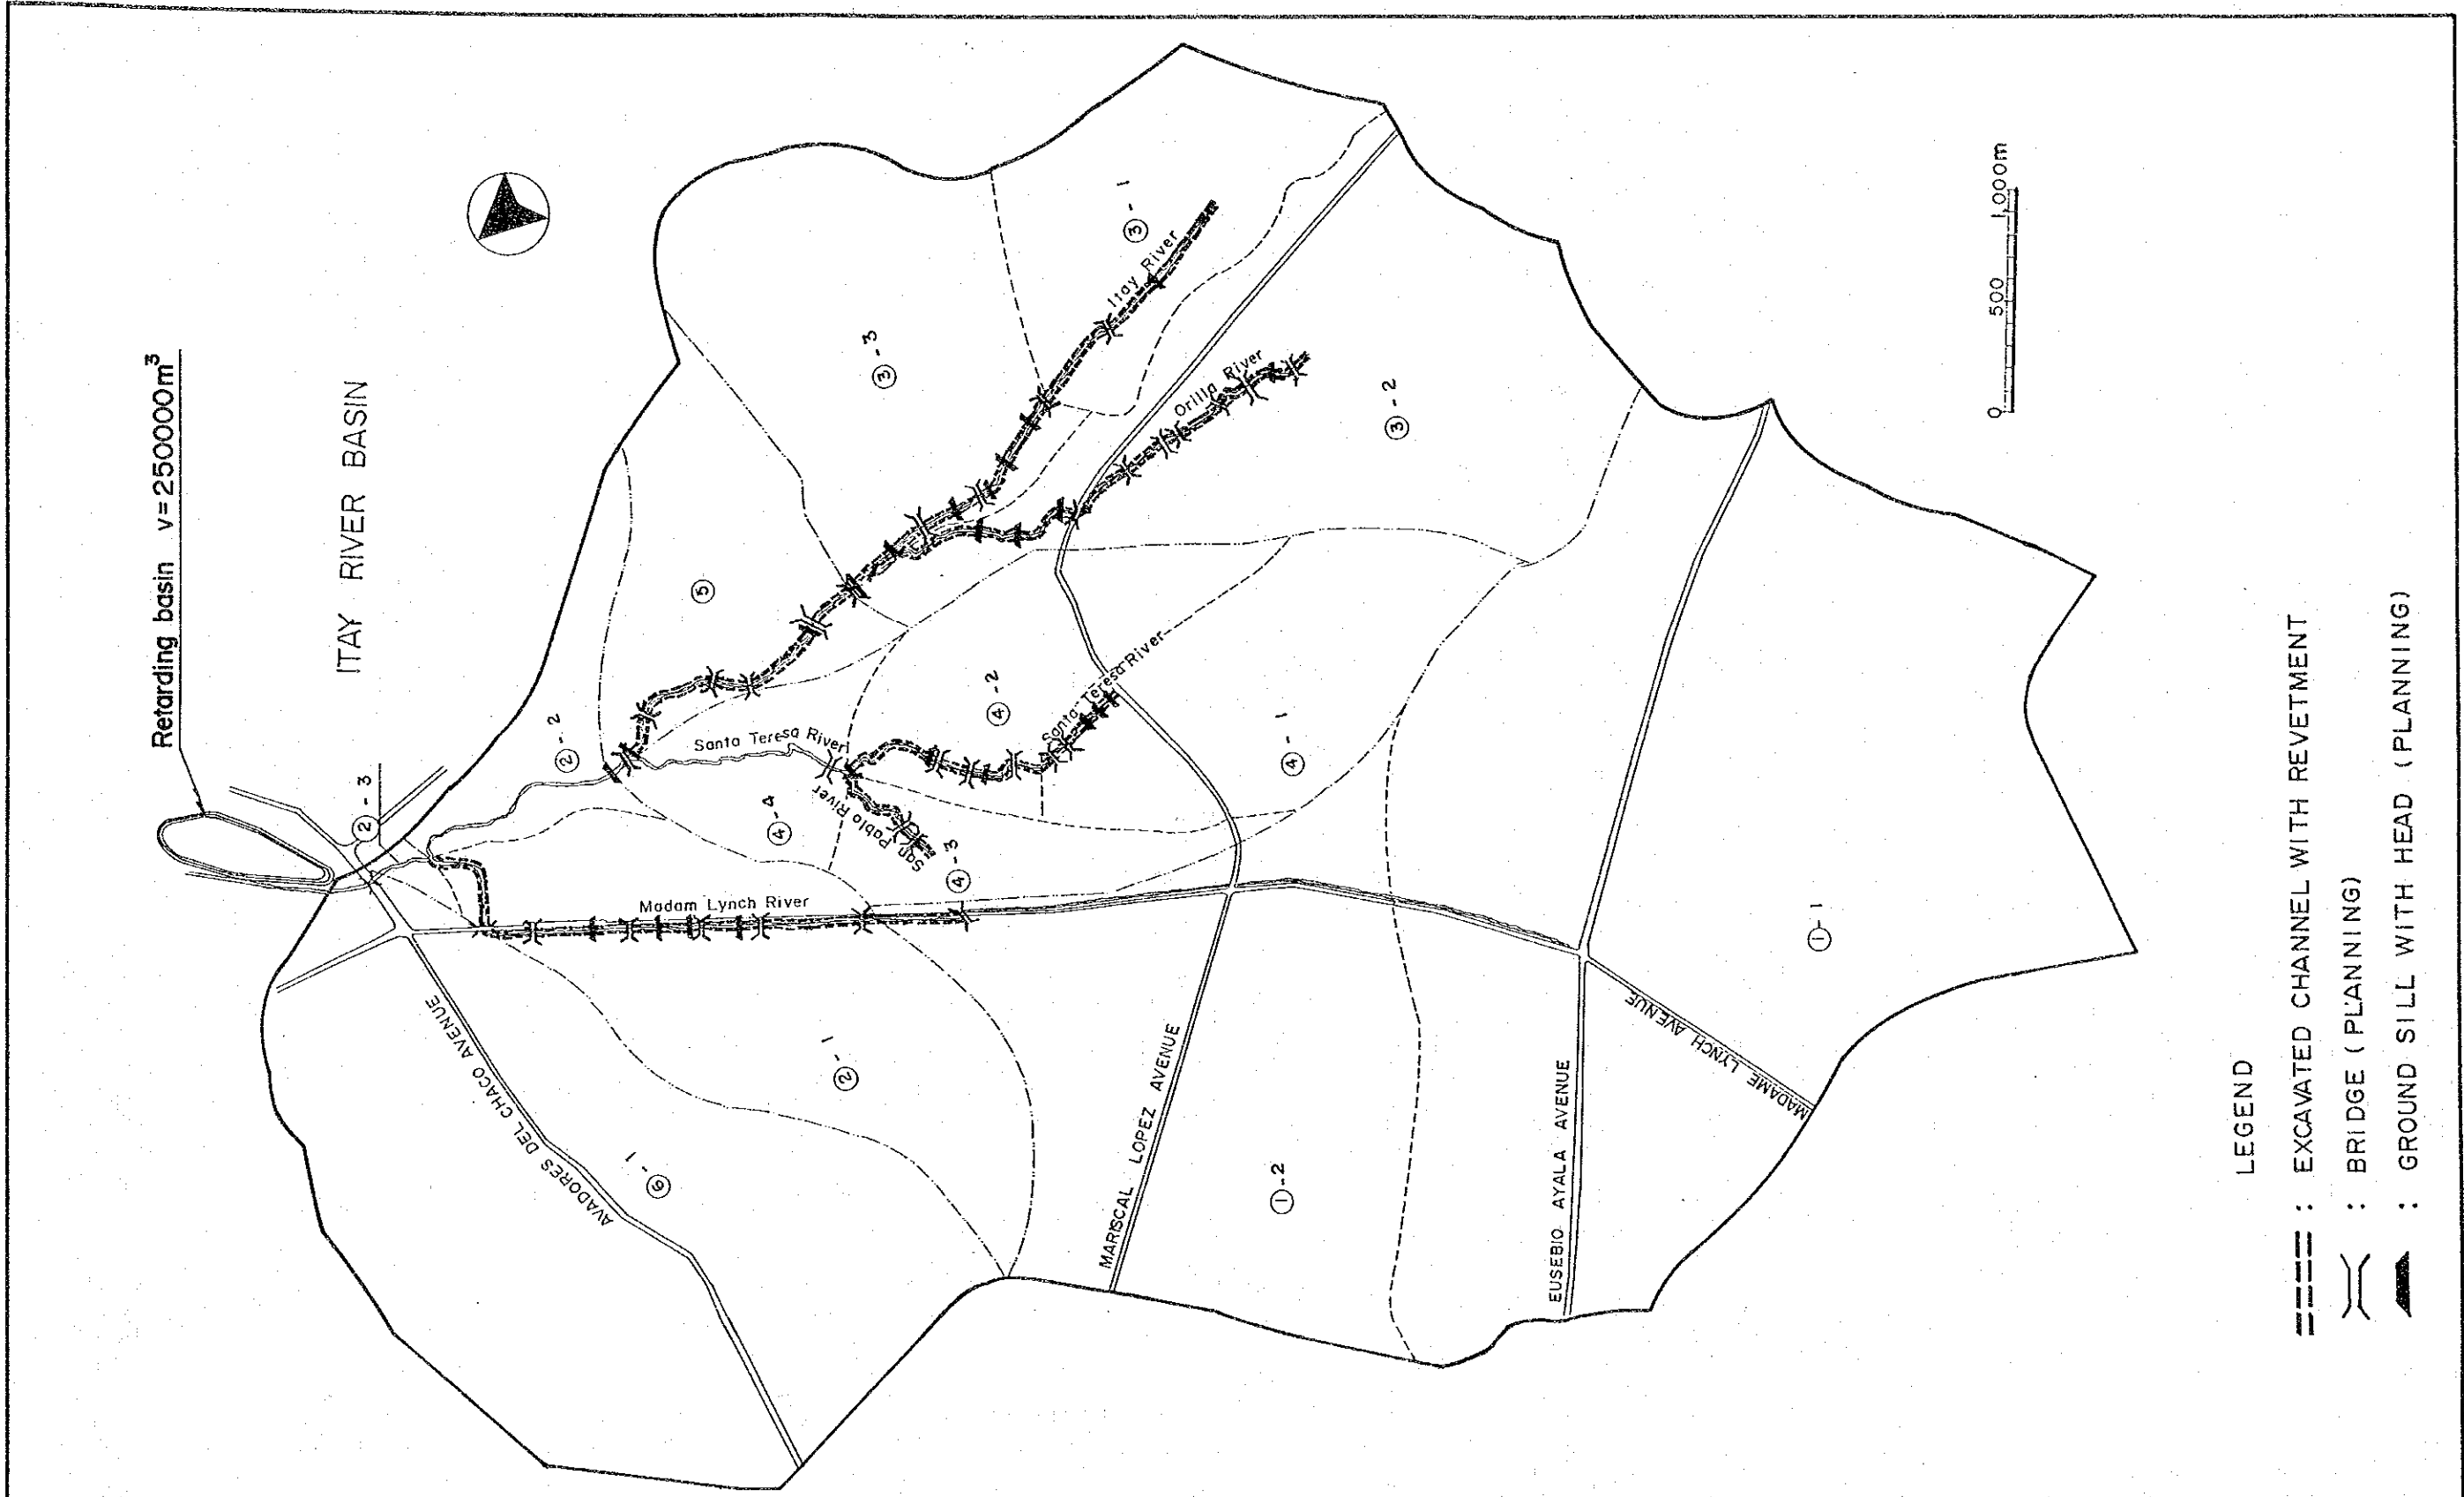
(1/2) LAYOUT OF PROPOSED RIPARIAN STRUCTURES FOR FIRST STAGE PROJECT
